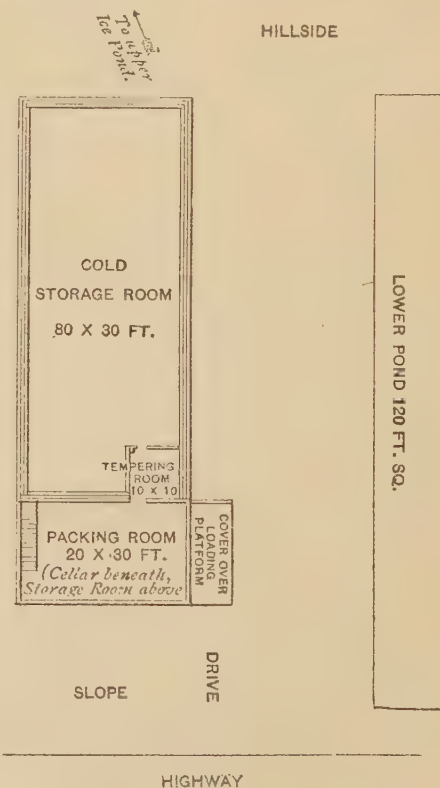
GROUND PLAN OF HOUSE, WITH SURROUNDINGS.
